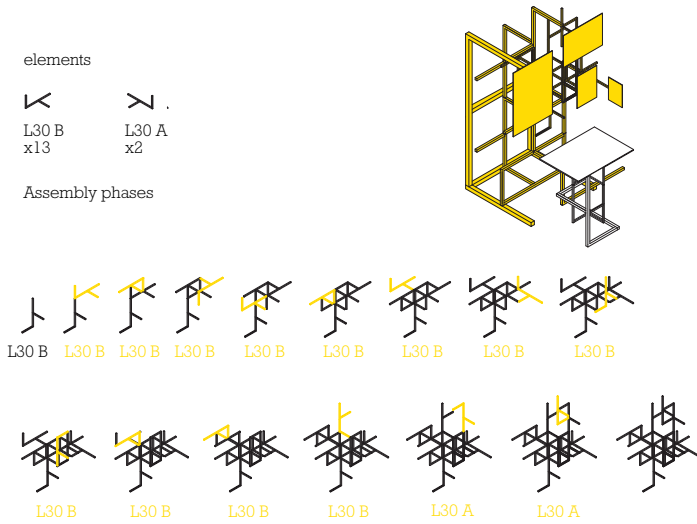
Construction detail - Abacus of exhibit elements | Axonometric views.
